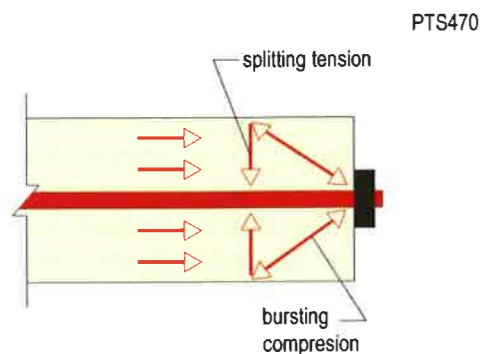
Dispersion of Force behind Anchorage
